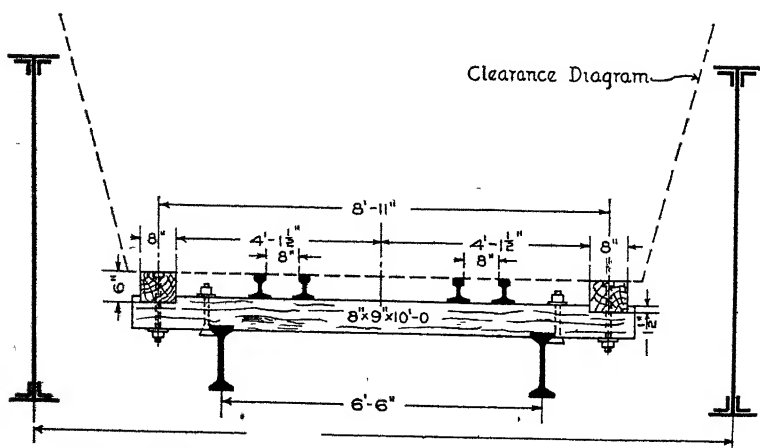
Floor Construction of a Through-Girder Bridge, Single Track. Lehigh Valley Standard.
